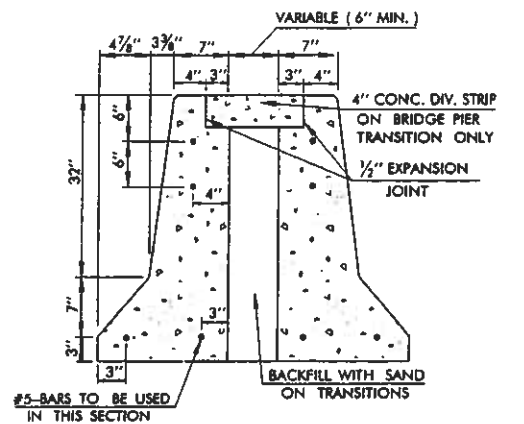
DETAIL OF TRANSITION SECTION AT BRIDGE PIERS
